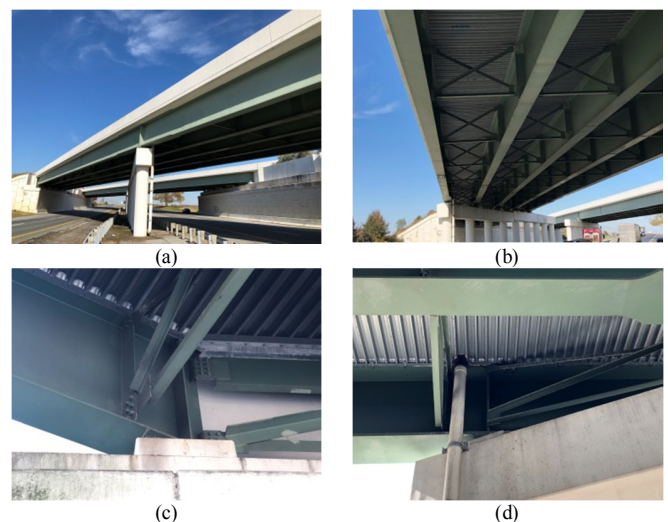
US13 Bridge in Delaware state, USA, (a) general view, (b) perpendicular cross-frame configuration, (c) bent plate connection in skew abutment support, and (d) bent plate connection in skew pier support.
